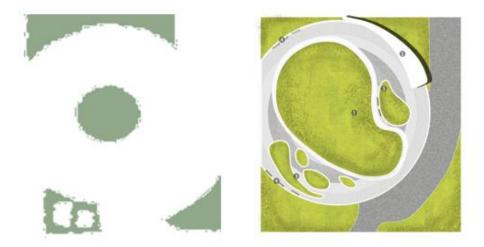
Plantation of Guanghutun Park design area. Source: by author
